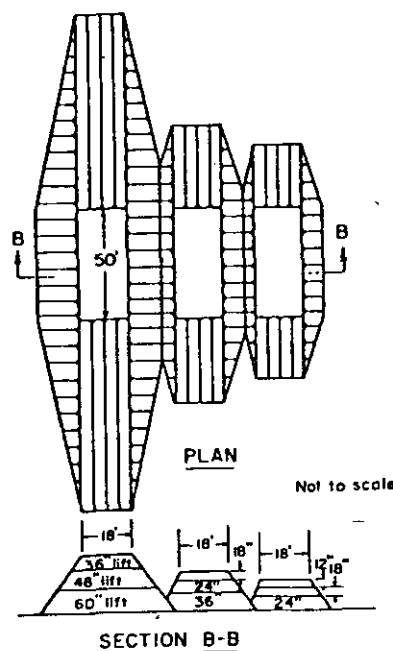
Plan and Section of Rockfill Test Section, Carters Dam, U.S.A.
